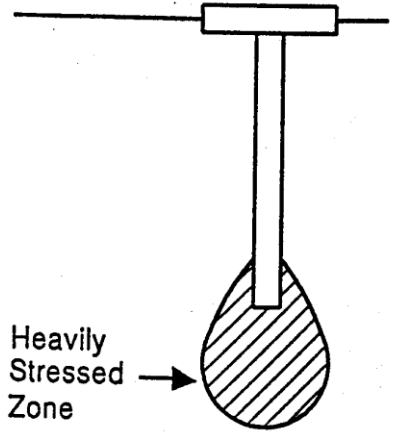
Stressed Zone Under End Bearing Single Pile
